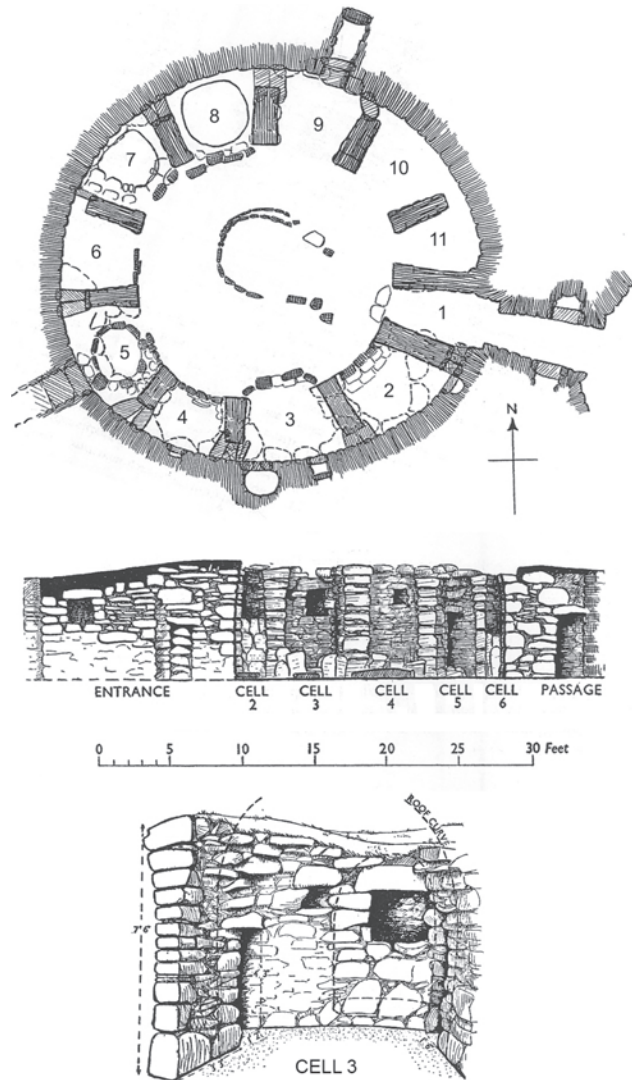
Plan and elevation of the Kilpheder wheelhouse (from Lethbridge 1952)
